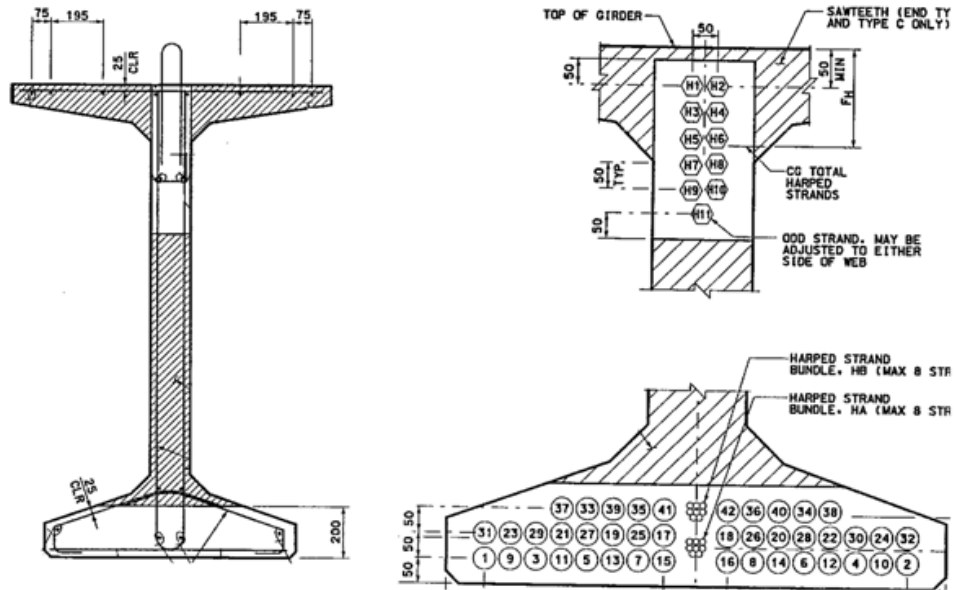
Girder Cross Section and Detail View of Prestressing strand Template (Dimensions in millimeters)
